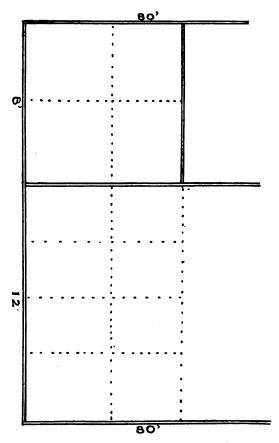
HOGHOUSE AND FEEDING FLOOR (PLAN).
